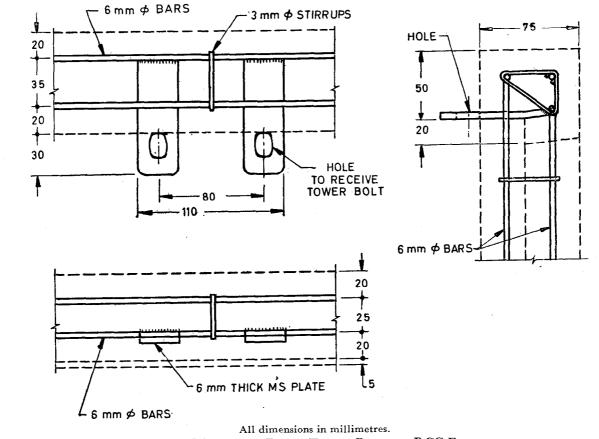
METHOD OF FIXING TOWER BOLTS TO RCC FRAMES
